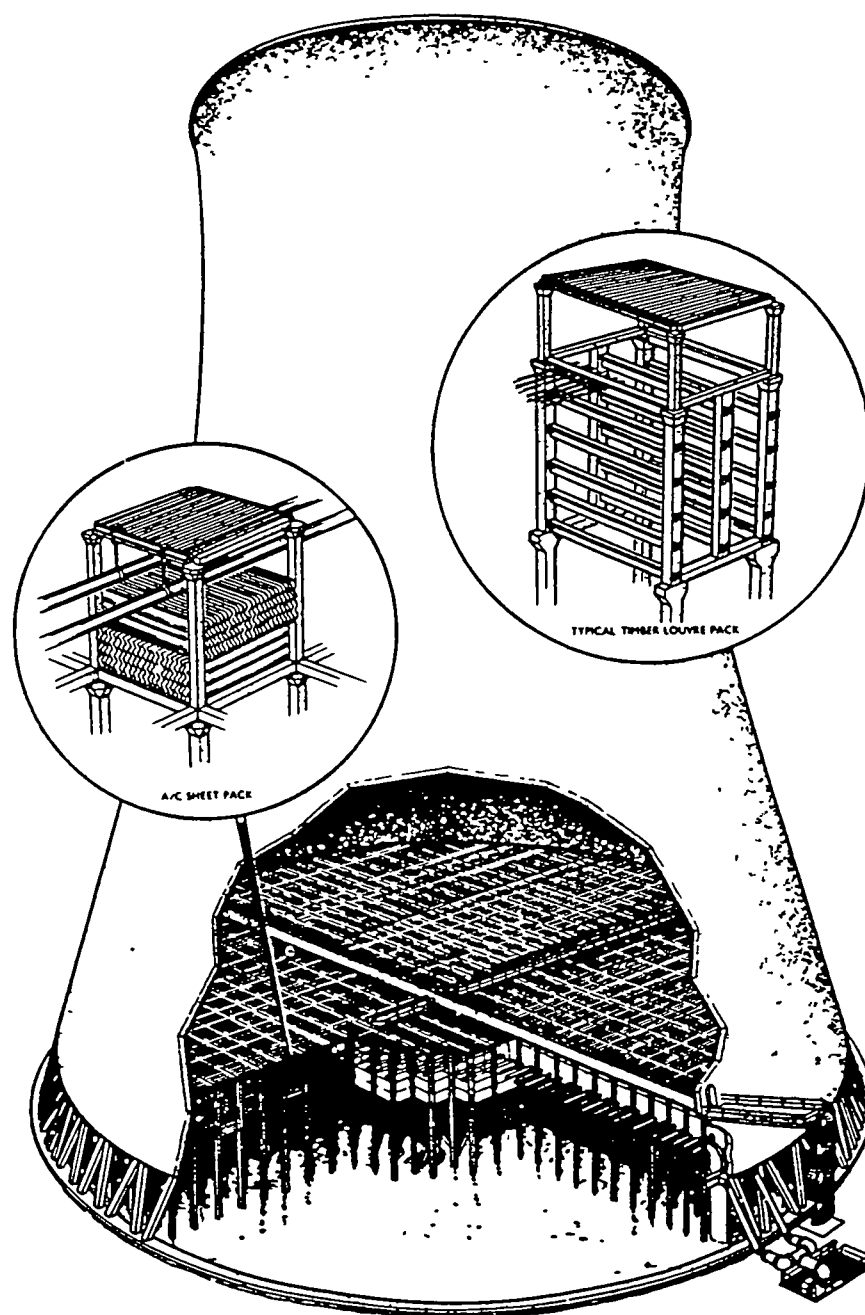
Ferro-concrete cooling tower (CEGB 1971, 247)
